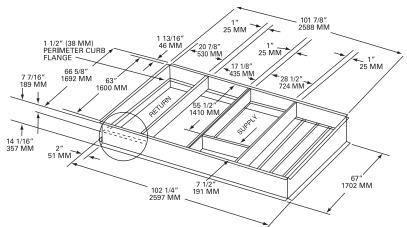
Heat Pump Models - 12½, 15 Tons * All dimensions are in inches/millimeters.
